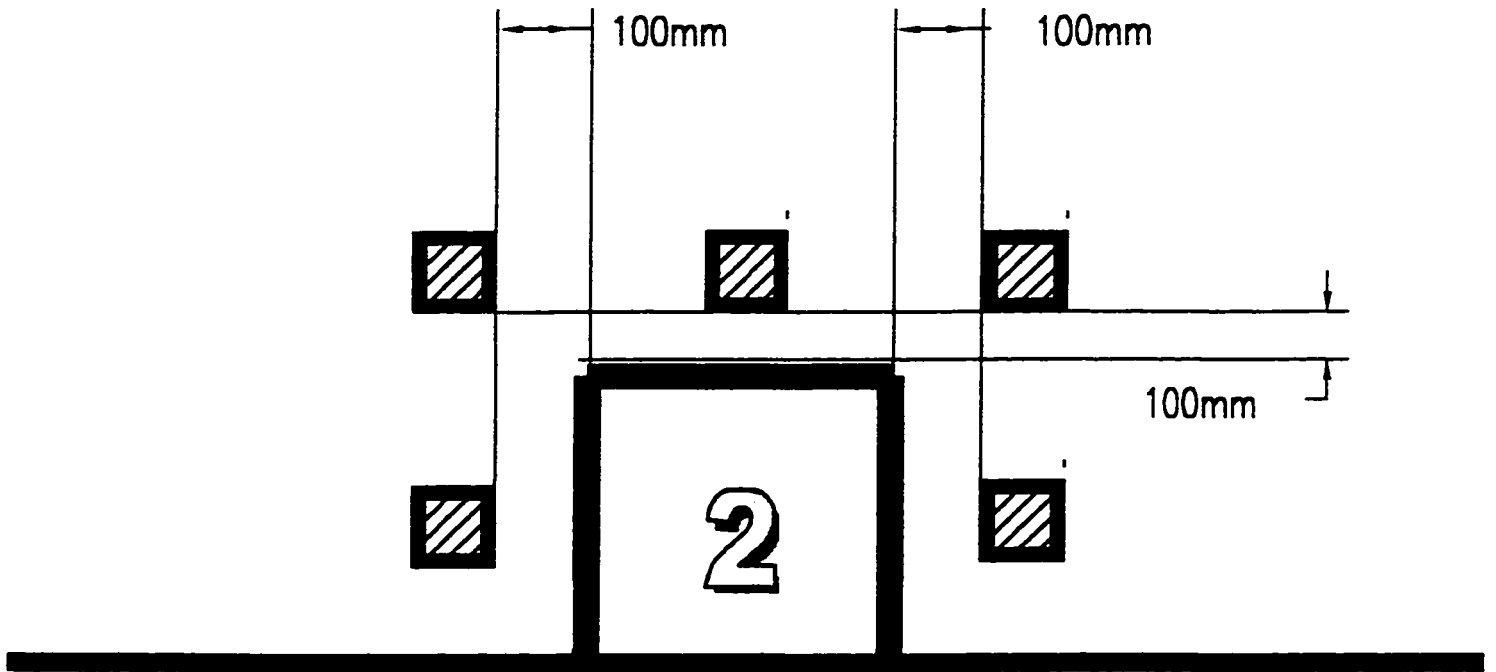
Reshoring of failure zone after column-slab connection failure in the periphery of column 2 in Test no. 1
